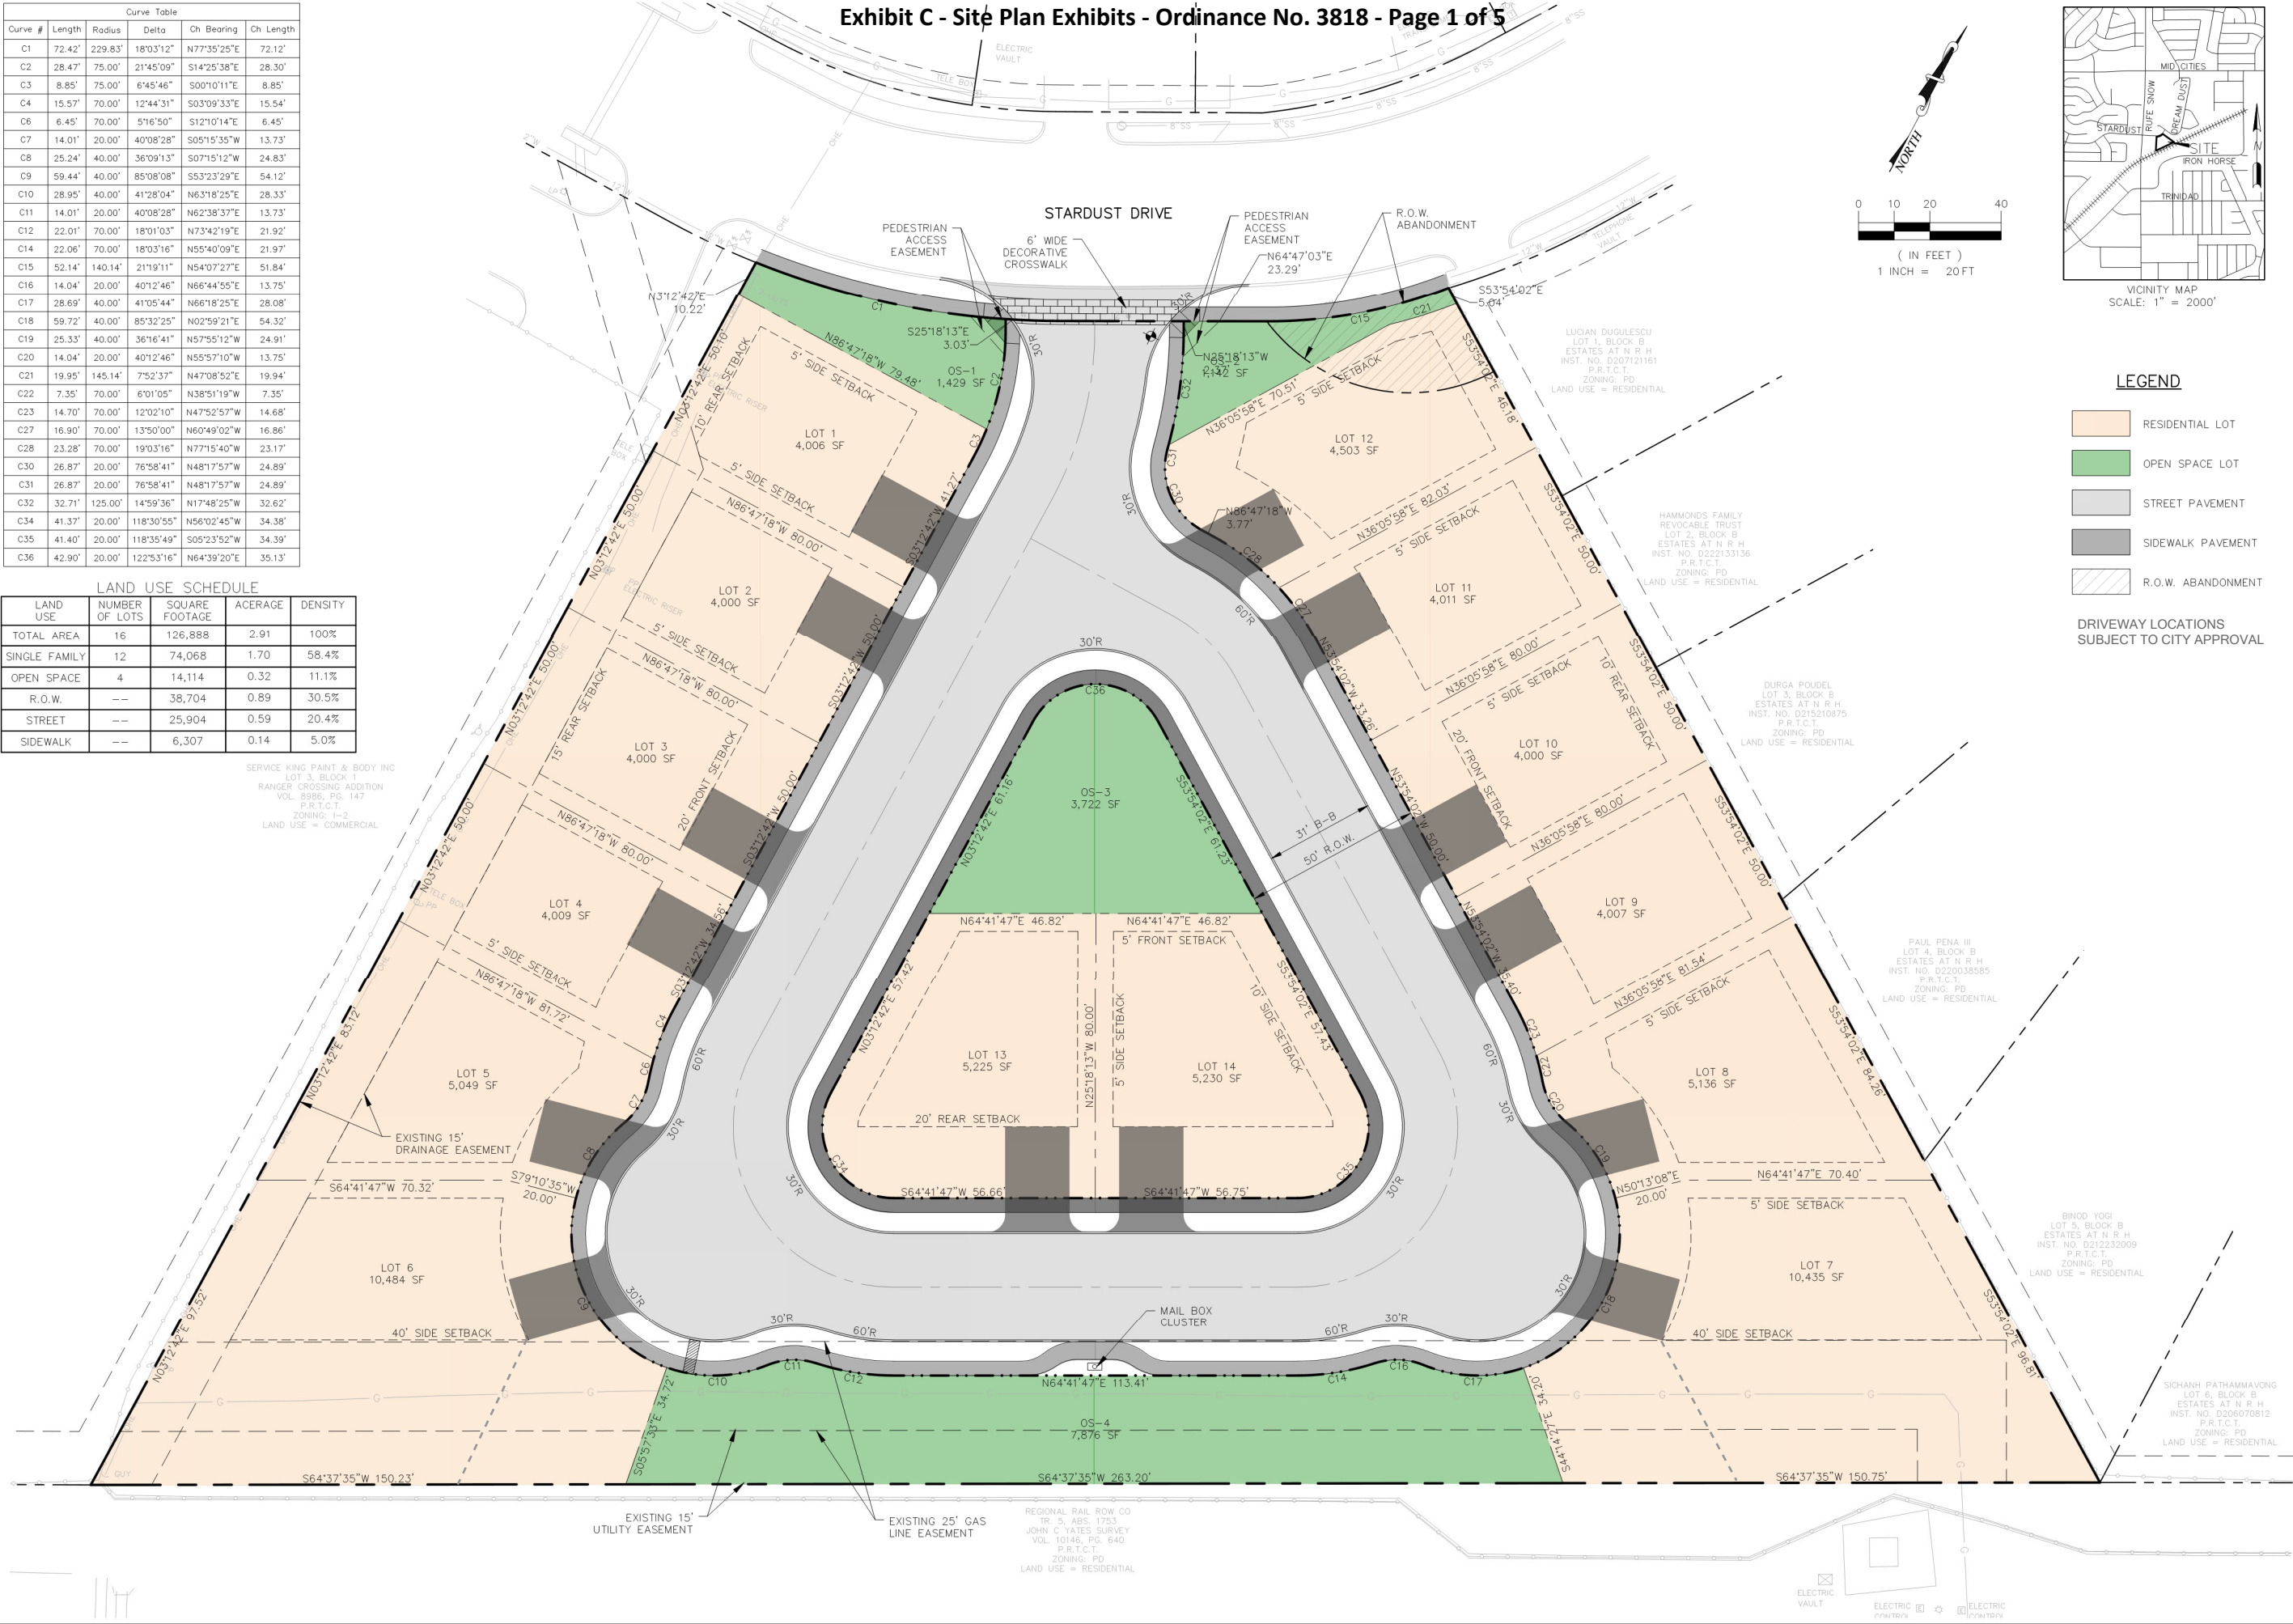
Exhibit C - Site Plan Exhibits - Ordinance No. 3818 - Page 1 of 5
